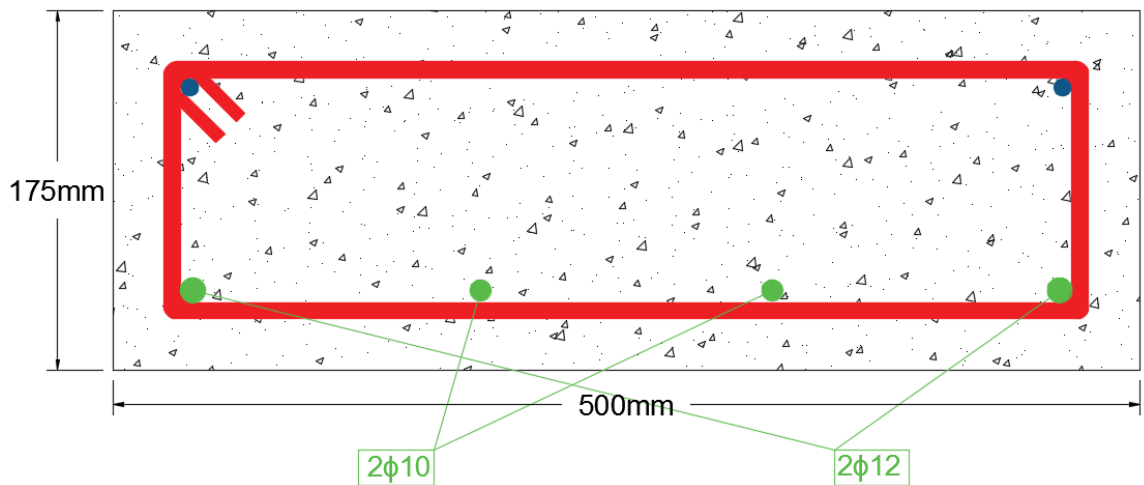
Cross Section of Balanced Reinforced One-Way Concrete Slabs Sample
